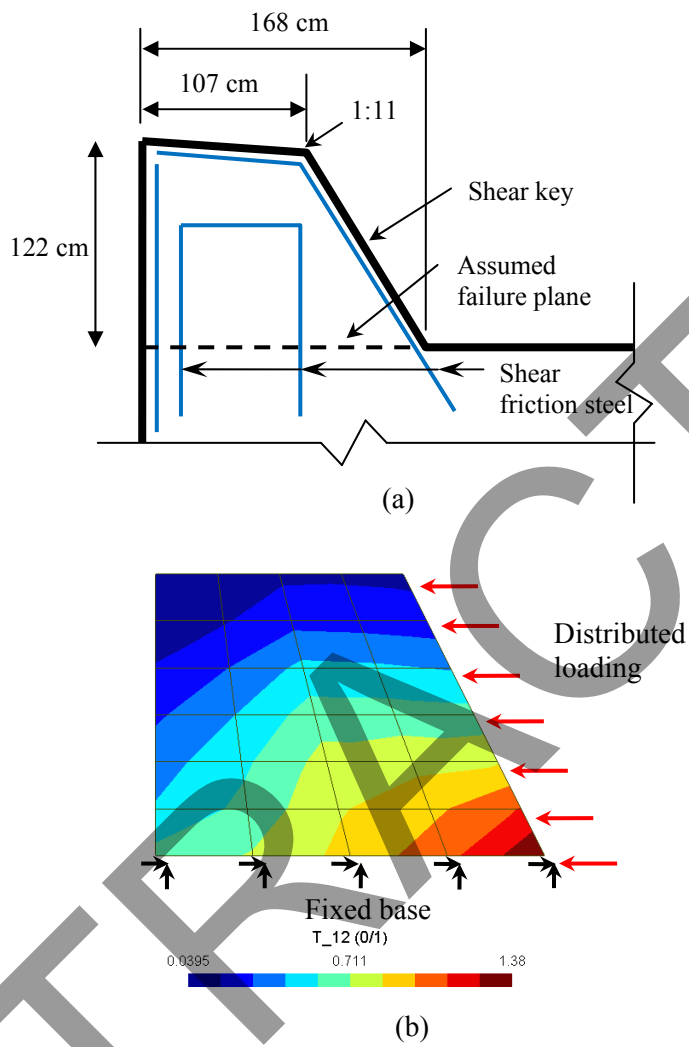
(a) Detail/elevation and (b) Plane stress finite element model for abutment shear keys
